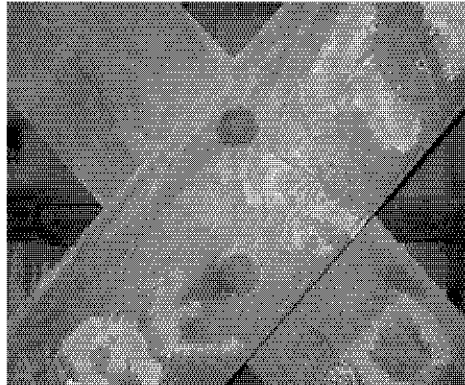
Photo of Typical Lattice Connection Using Treenails.
